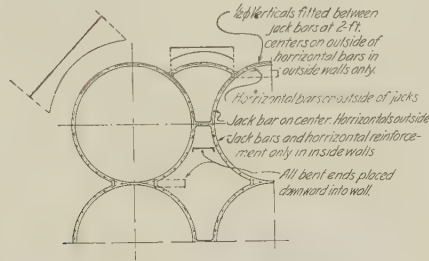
ARRANGEMENT OF REINFORCEMENT FOR CIRCULAR BINS
